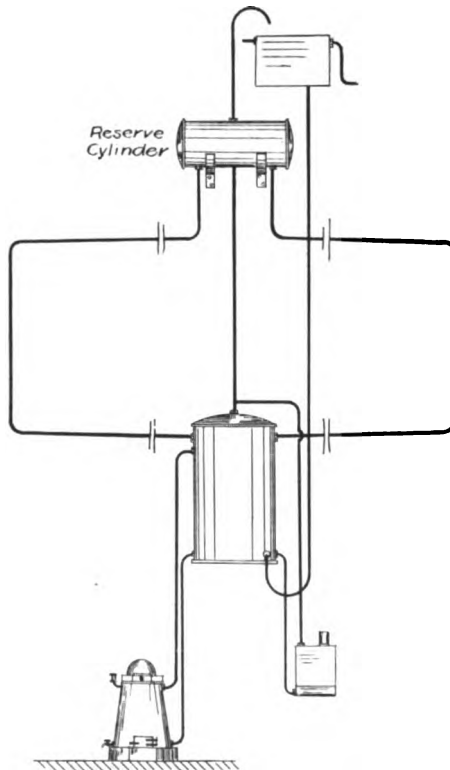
Cylinder and Tank Combined System with Duplicate Boilers.
